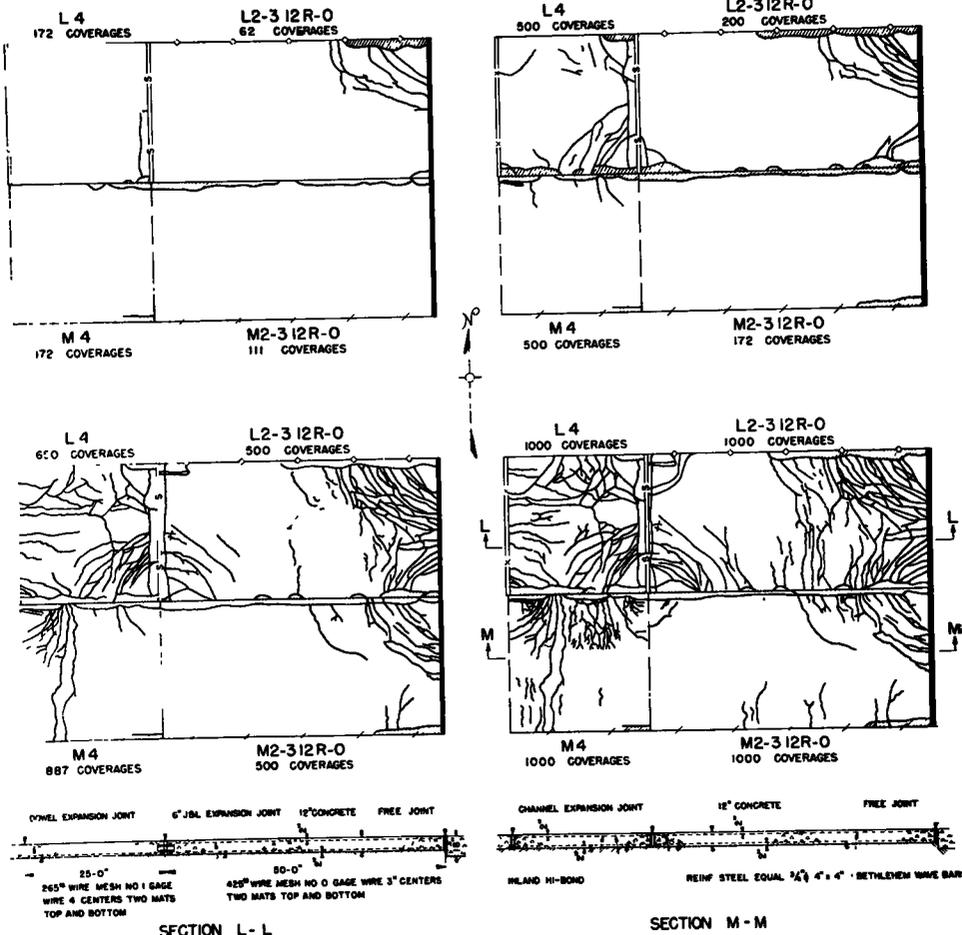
A Typical Crack Pattern Development at Lockbourne Army Air Base of a 12-inch Reinforced Slab.
